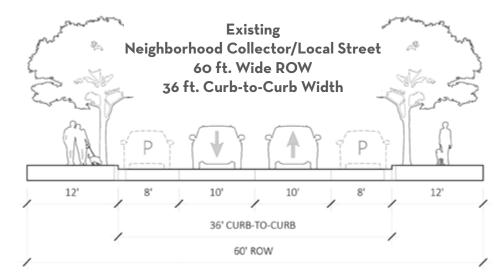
Existing: Typical Neighborhood Collector/Local Street with a 60 ft. wide ROW and 36 ft. wide curb-to-curb.
